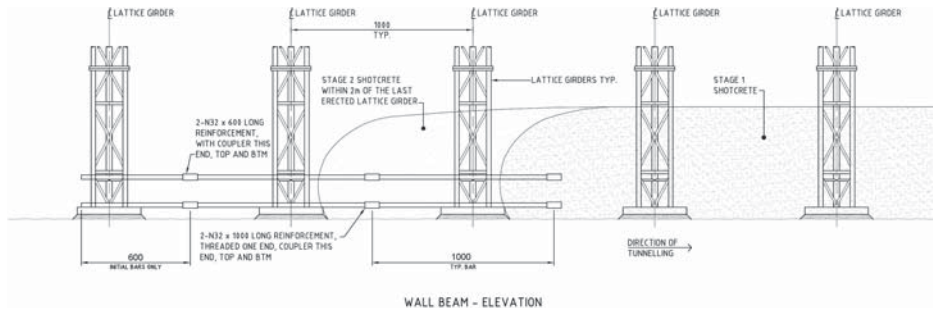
Longitudinal section along wall beam showing the shotcreting sequence.
